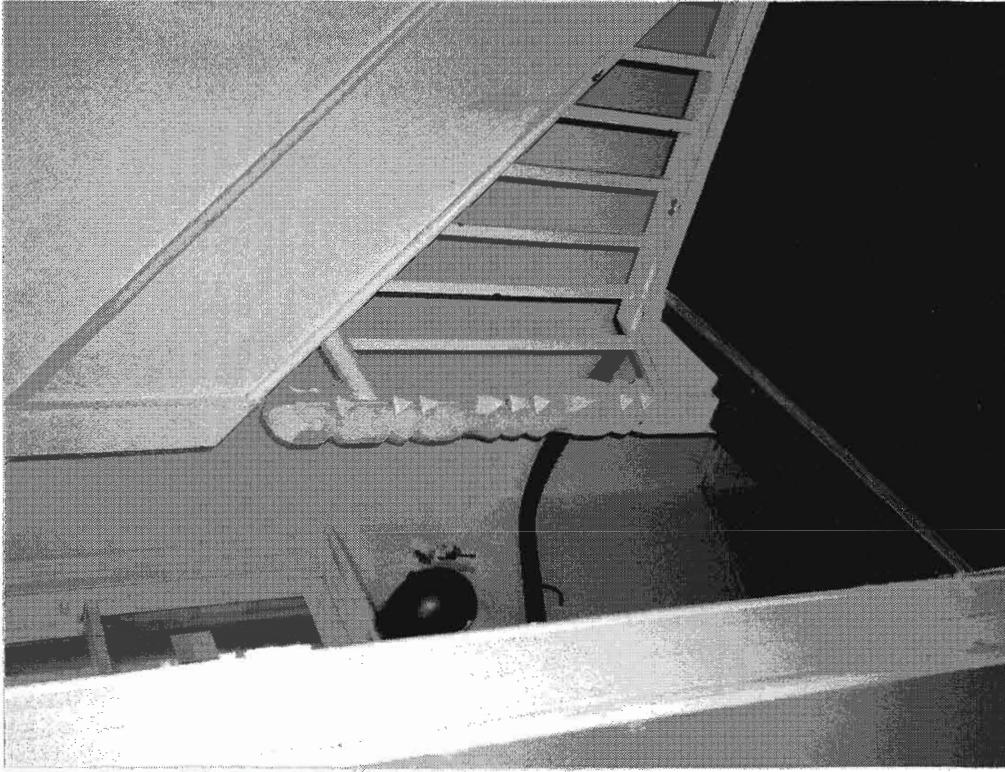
Staircase detail in 49 Market Street, showing the scalloped newel with faceted finial, stick baluster and round handrail.
